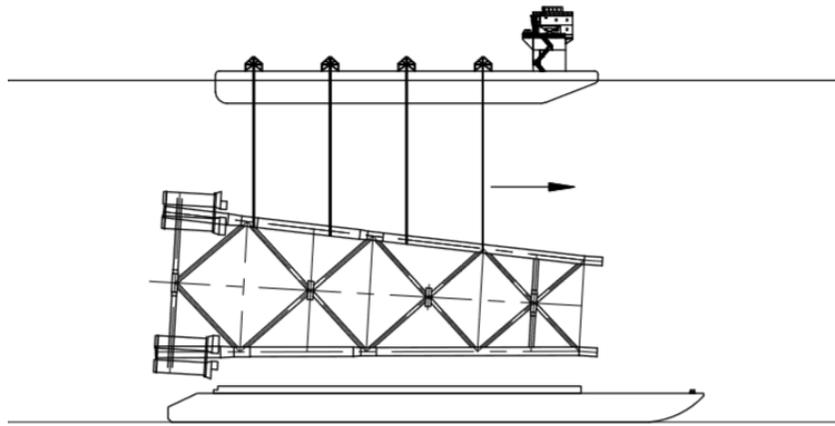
The jacket hanging underneath a single barge can be hovered over a fully submersible barge after being toppled and lifted.
